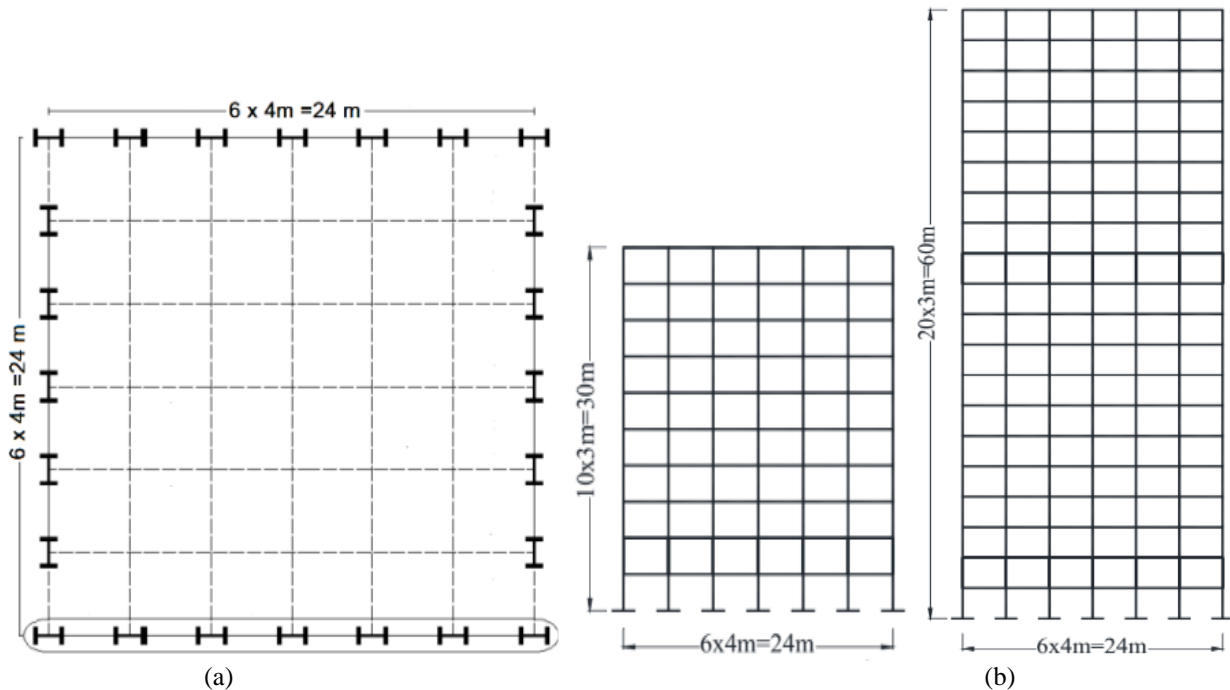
a) The typical plan of the buildings used in this study, and b) Elevation of ten and twenty-story steel special moment frames
